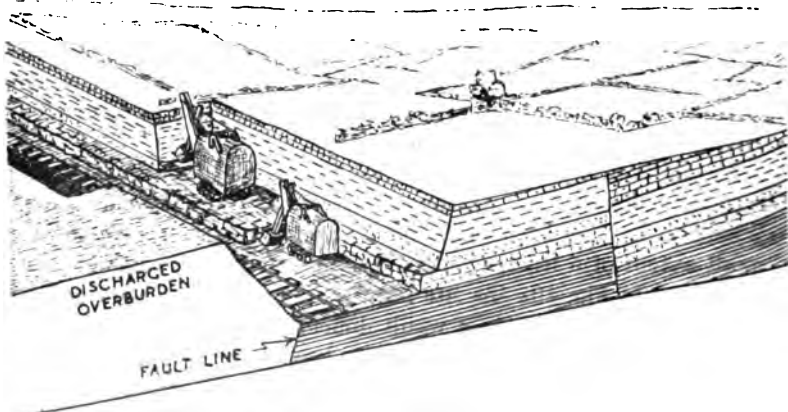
B.—Power shovels stripping overburden and excavating ironstone along a line parallel to the faults.
